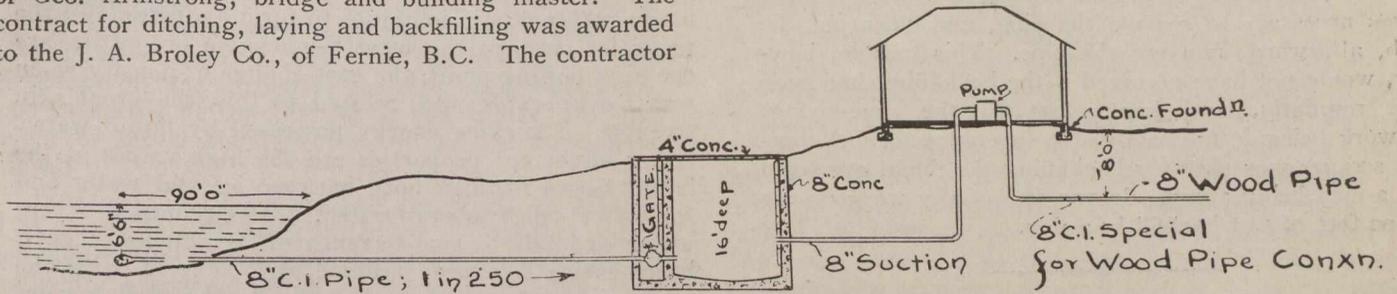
Section Showing General Arrangement of Plant and Piping.
